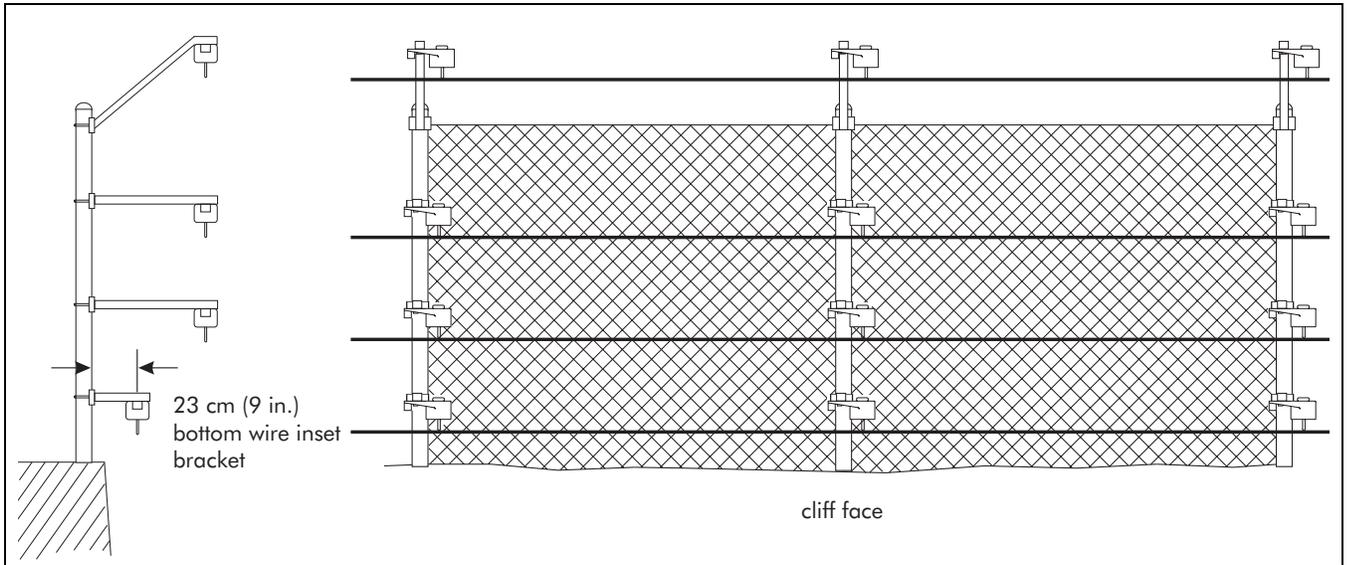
Four-wire fence-mounted bottom wire inset configuration
